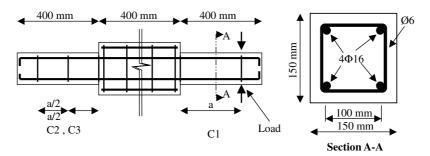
Original test specimens' reinforcement, a = 260 mm.
